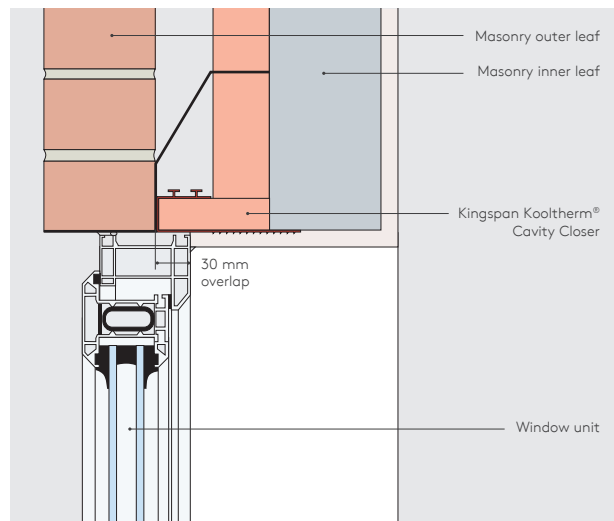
Head Detail Incorporating Kingspan Kooltherm® Cavity Closer
